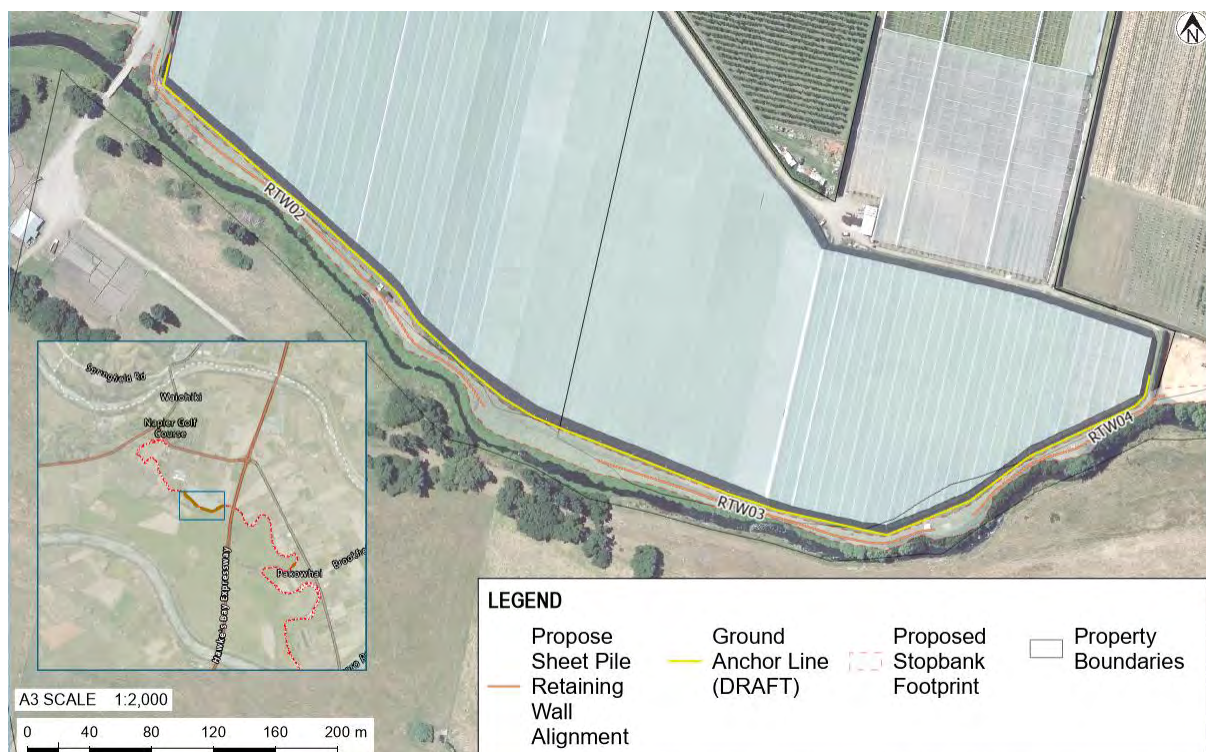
The alignment of the proposed sheet piling floodwall option.
